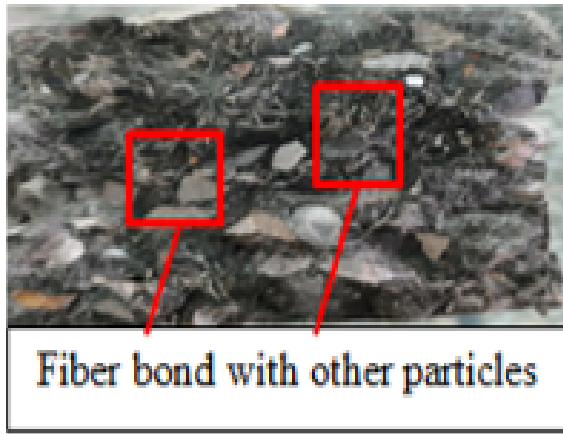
Fractured Surfaces of Different Tested Specimens
